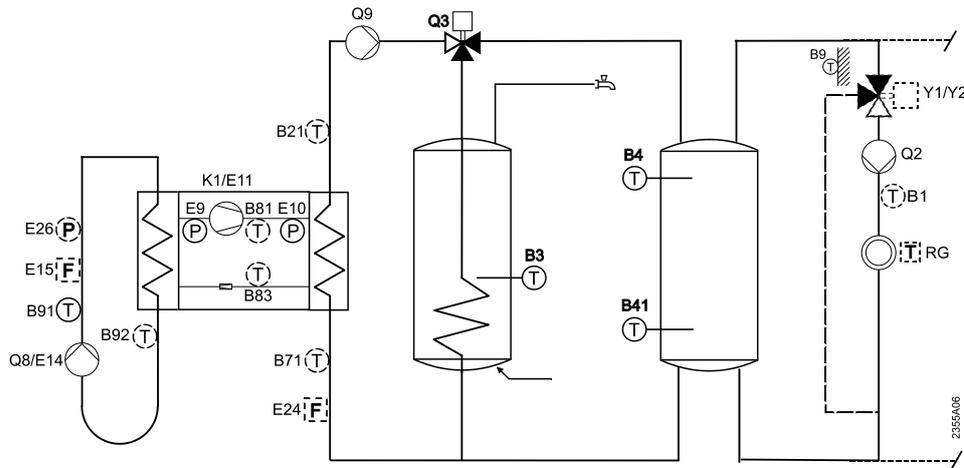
DHW storage tank and space heating with the buffer storage tank (additional storage tank)
